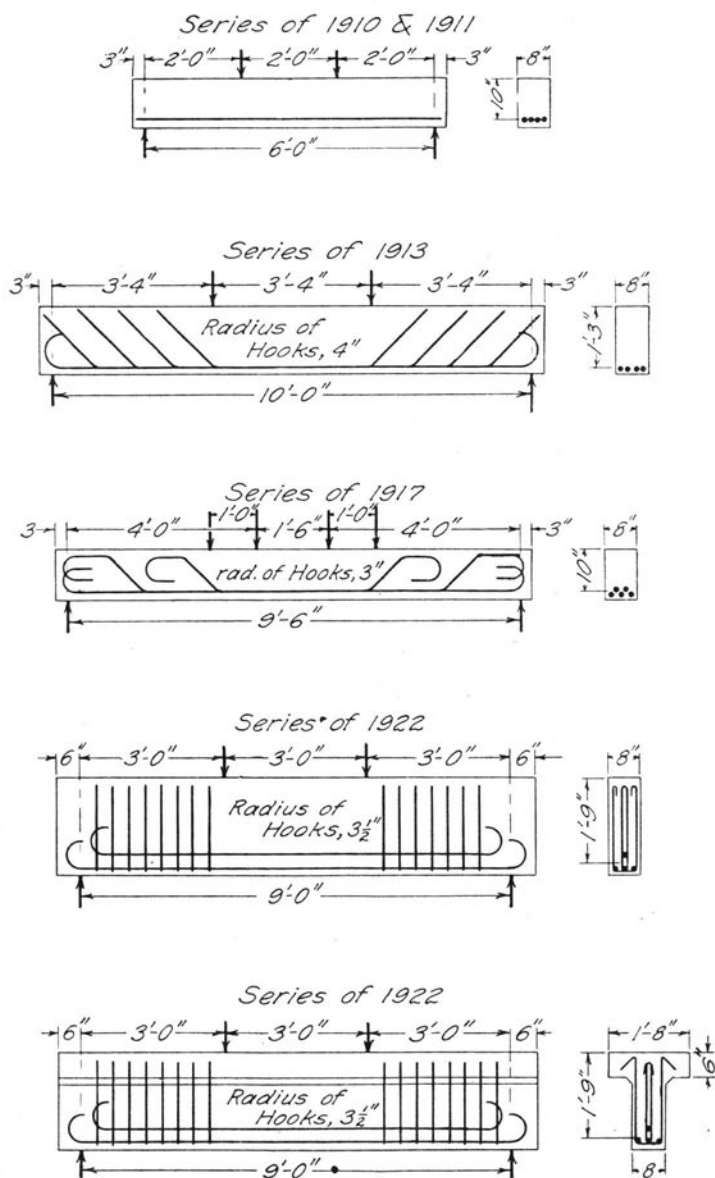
GENERAL DIMENSIONS OF TEST BEAMS
